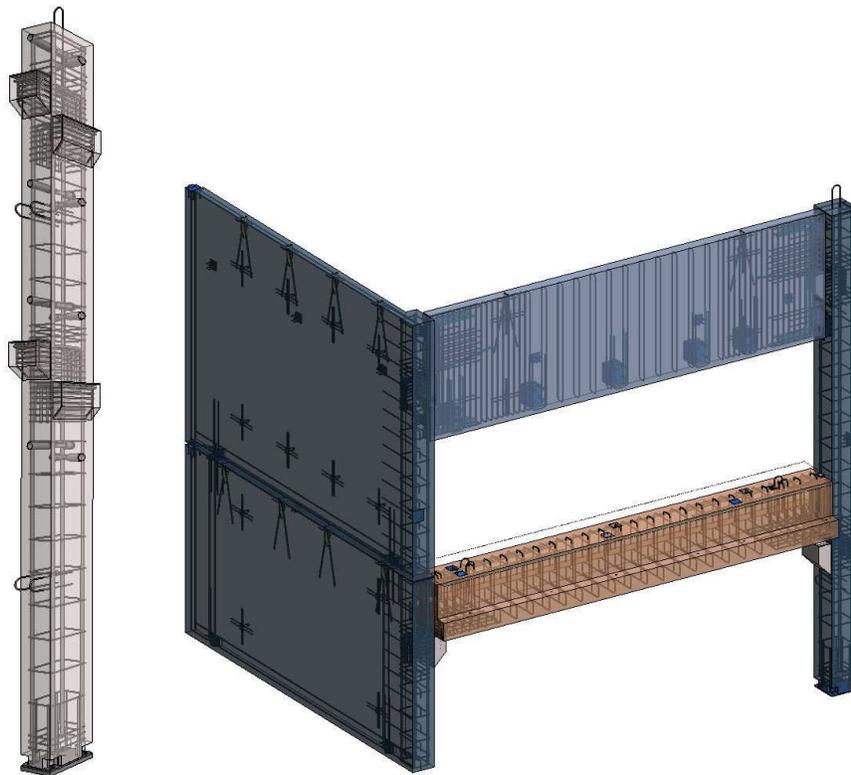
PRECAST PIECES WITH REINFORCING, EMBED, AND LIFTING ELEMENTS SHOWN
